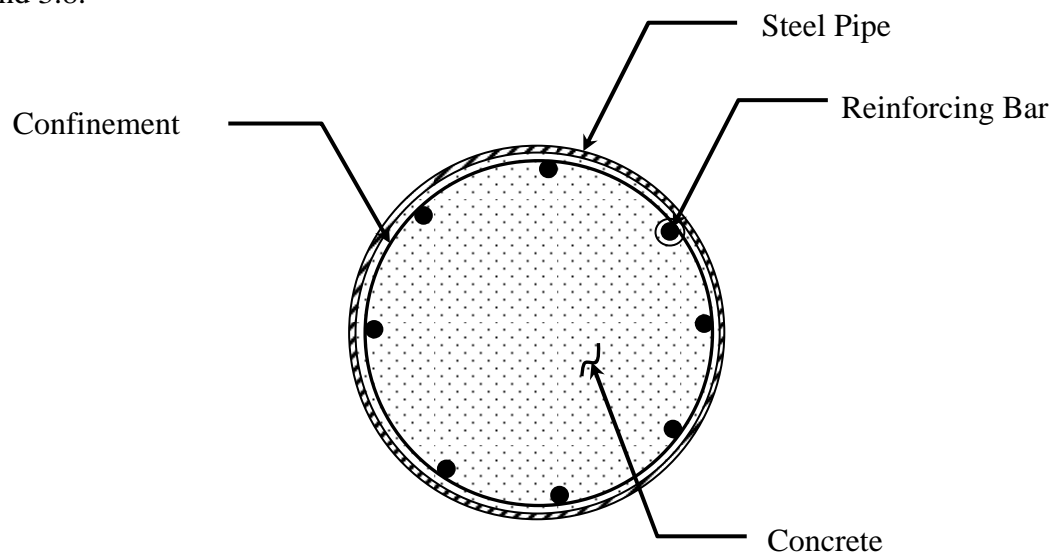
Typical Section of a Steel Pipe Pile Filled with
